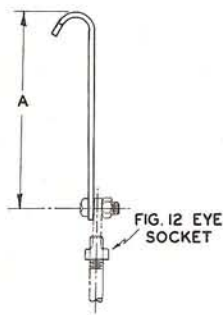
"Q" Deck Hangers are used to hang light loads on pan type construction. When ordering: specify dimension "A" and eye socket size required.
